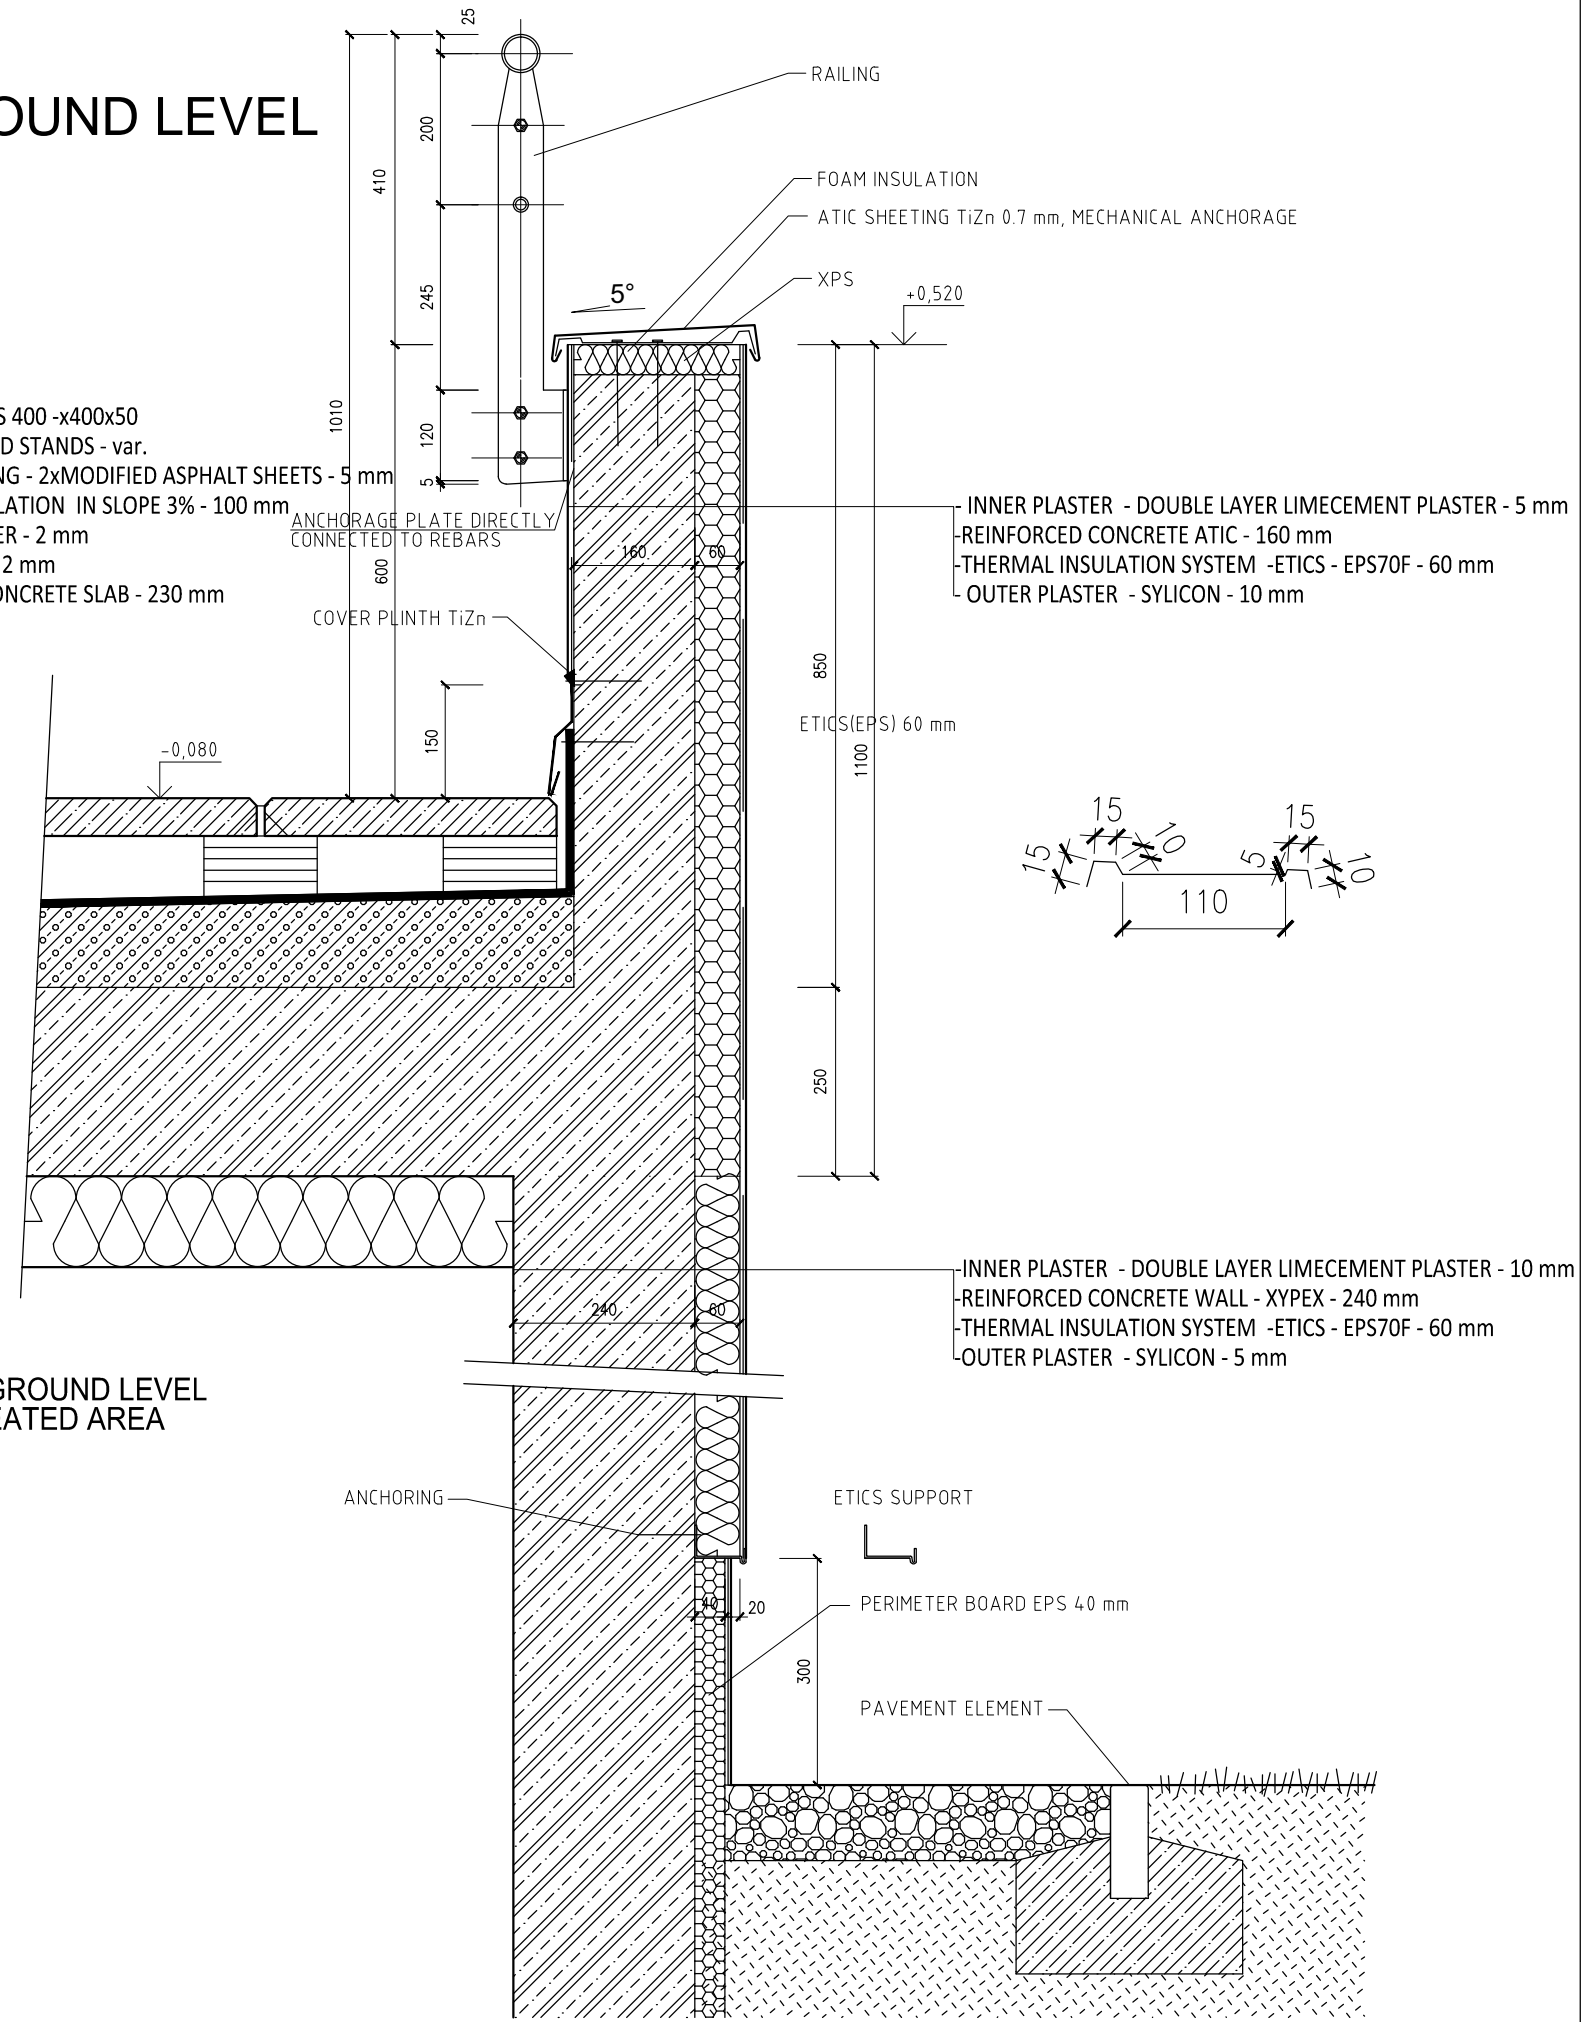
TERRACE OF FIRST FLOOR OVER UNDEGROUND LEVEL FIRST FLOOR
